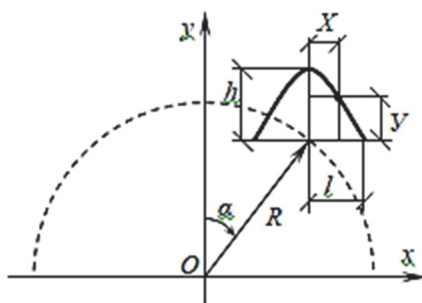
A method of forming surface of congruent parabolic cross sections of pendulum type on circular cylinder
